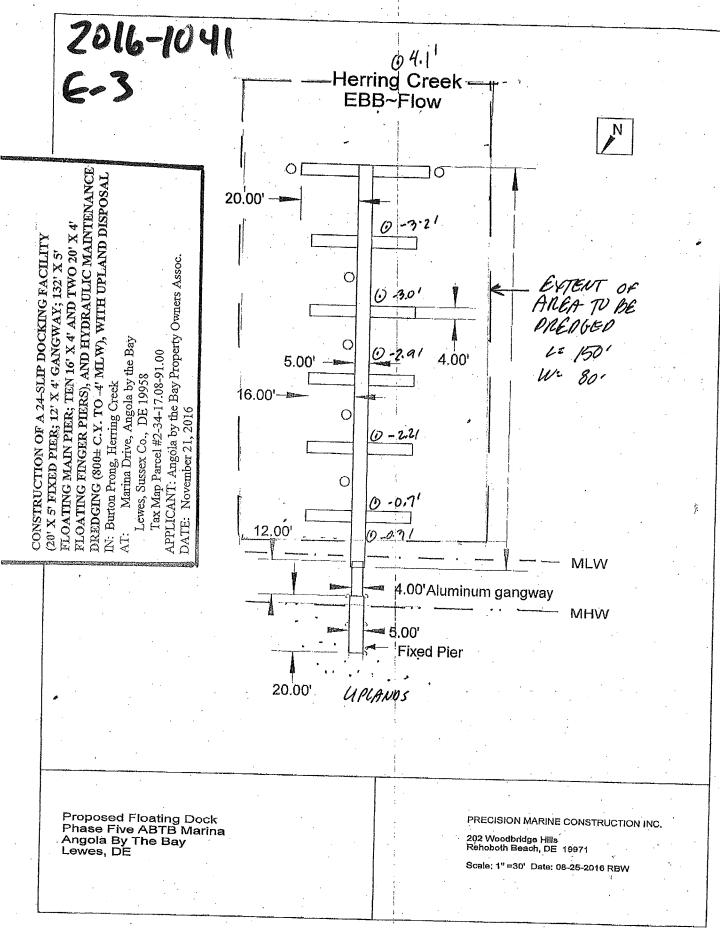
Plan view of proposed marina structure (prepared by Precision Marine Construction, Inc.). Existing MLW depths and area to be dredged also denicted
